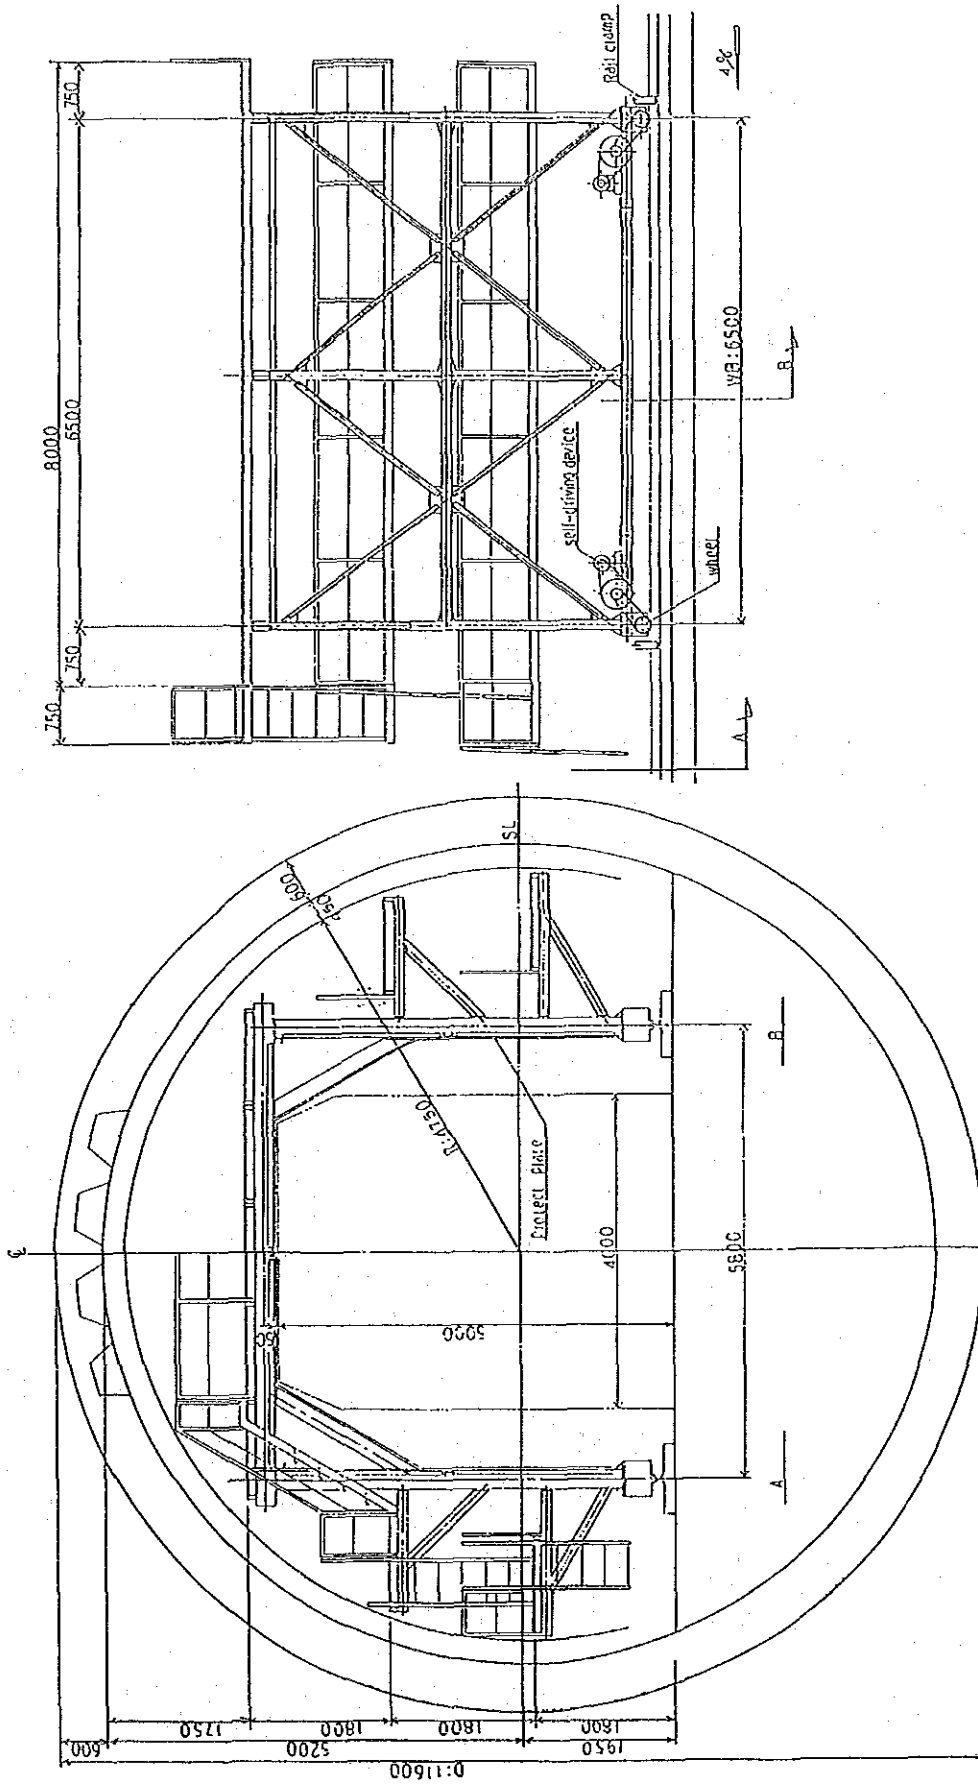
Scaffolding Wheels for Interior Installation:
